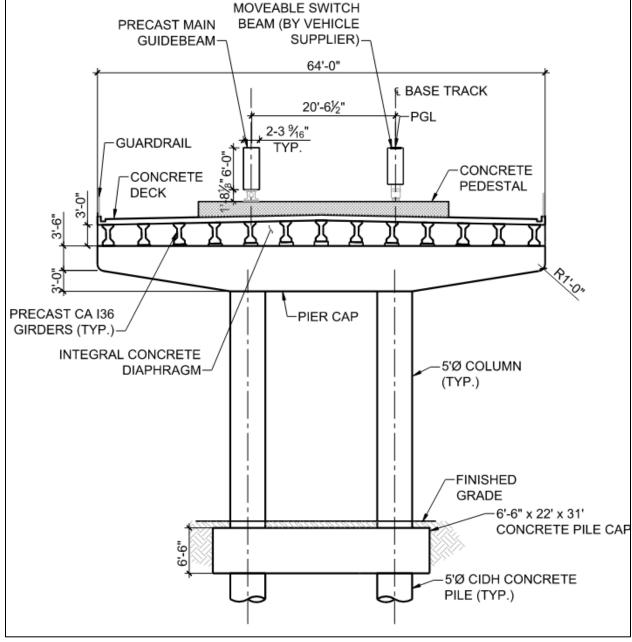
Typical Monorail Beam Switch Cross-Section
